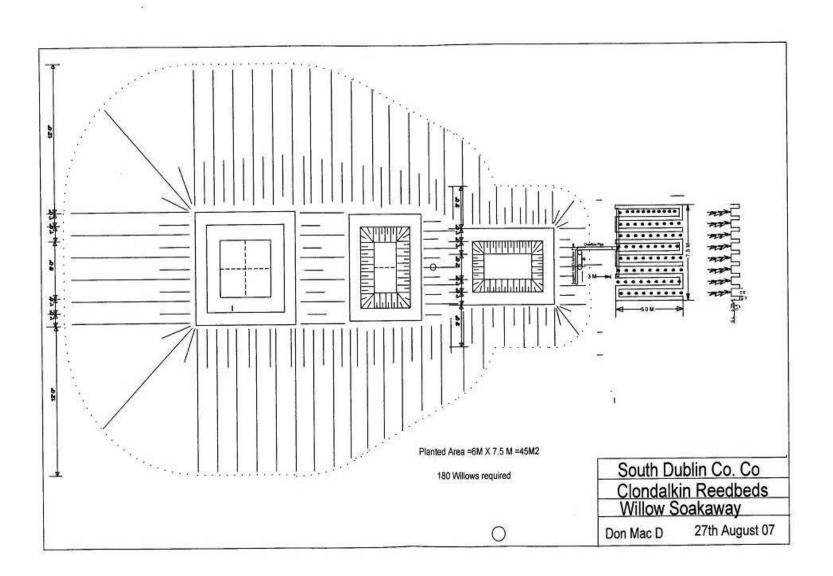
Plan View of Hybrid Reed and Willow Bed Wastewater Treatment Facility, Lynches Lane, Co. Dublin
